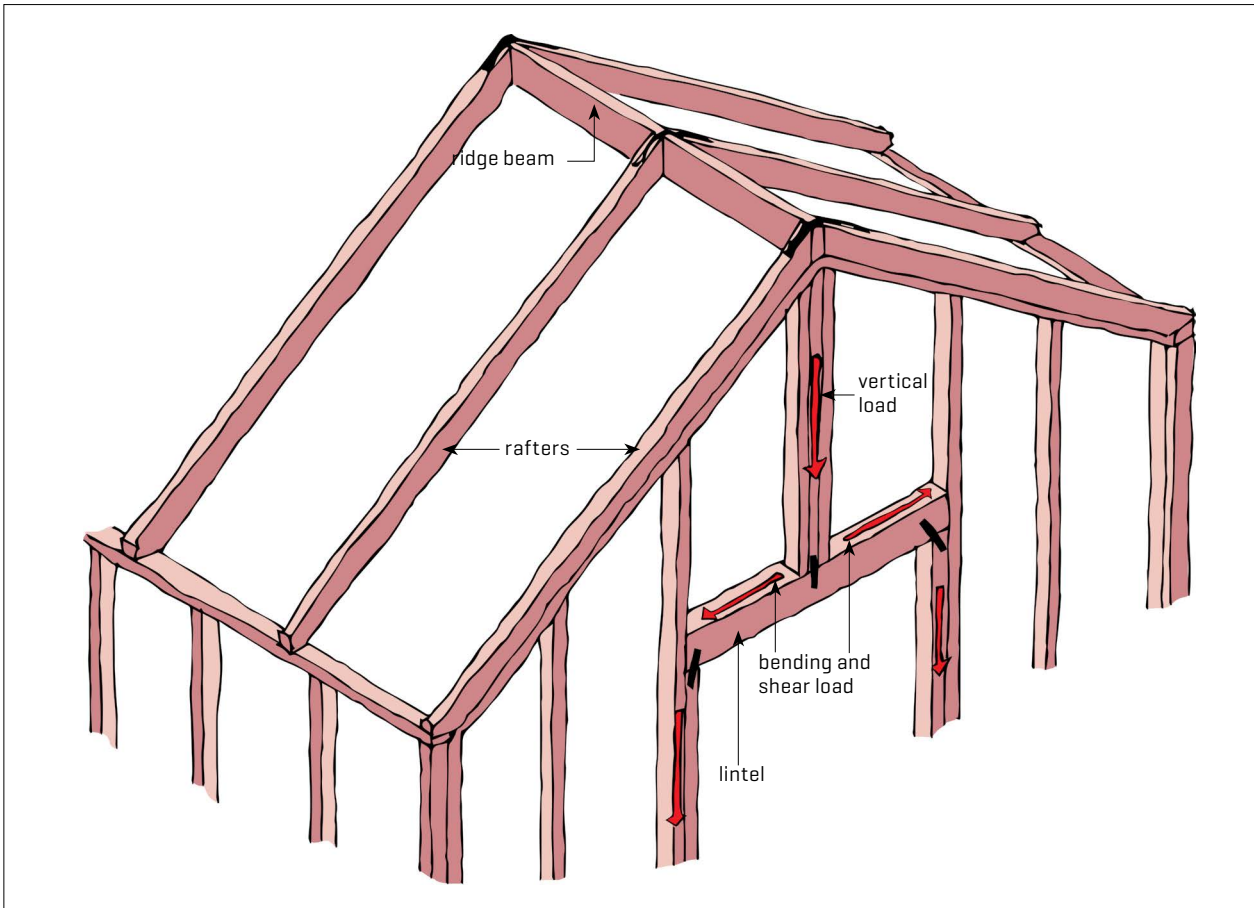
Ridge beam support of gravity loads [uplift loads work in reverse].
